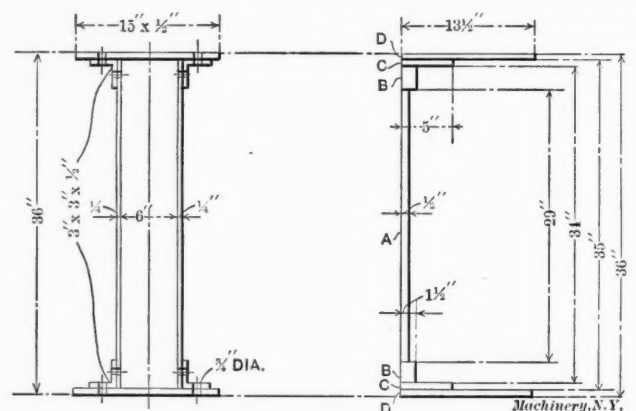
Proposed Section of Girder, drawn to convenience its Calculation
